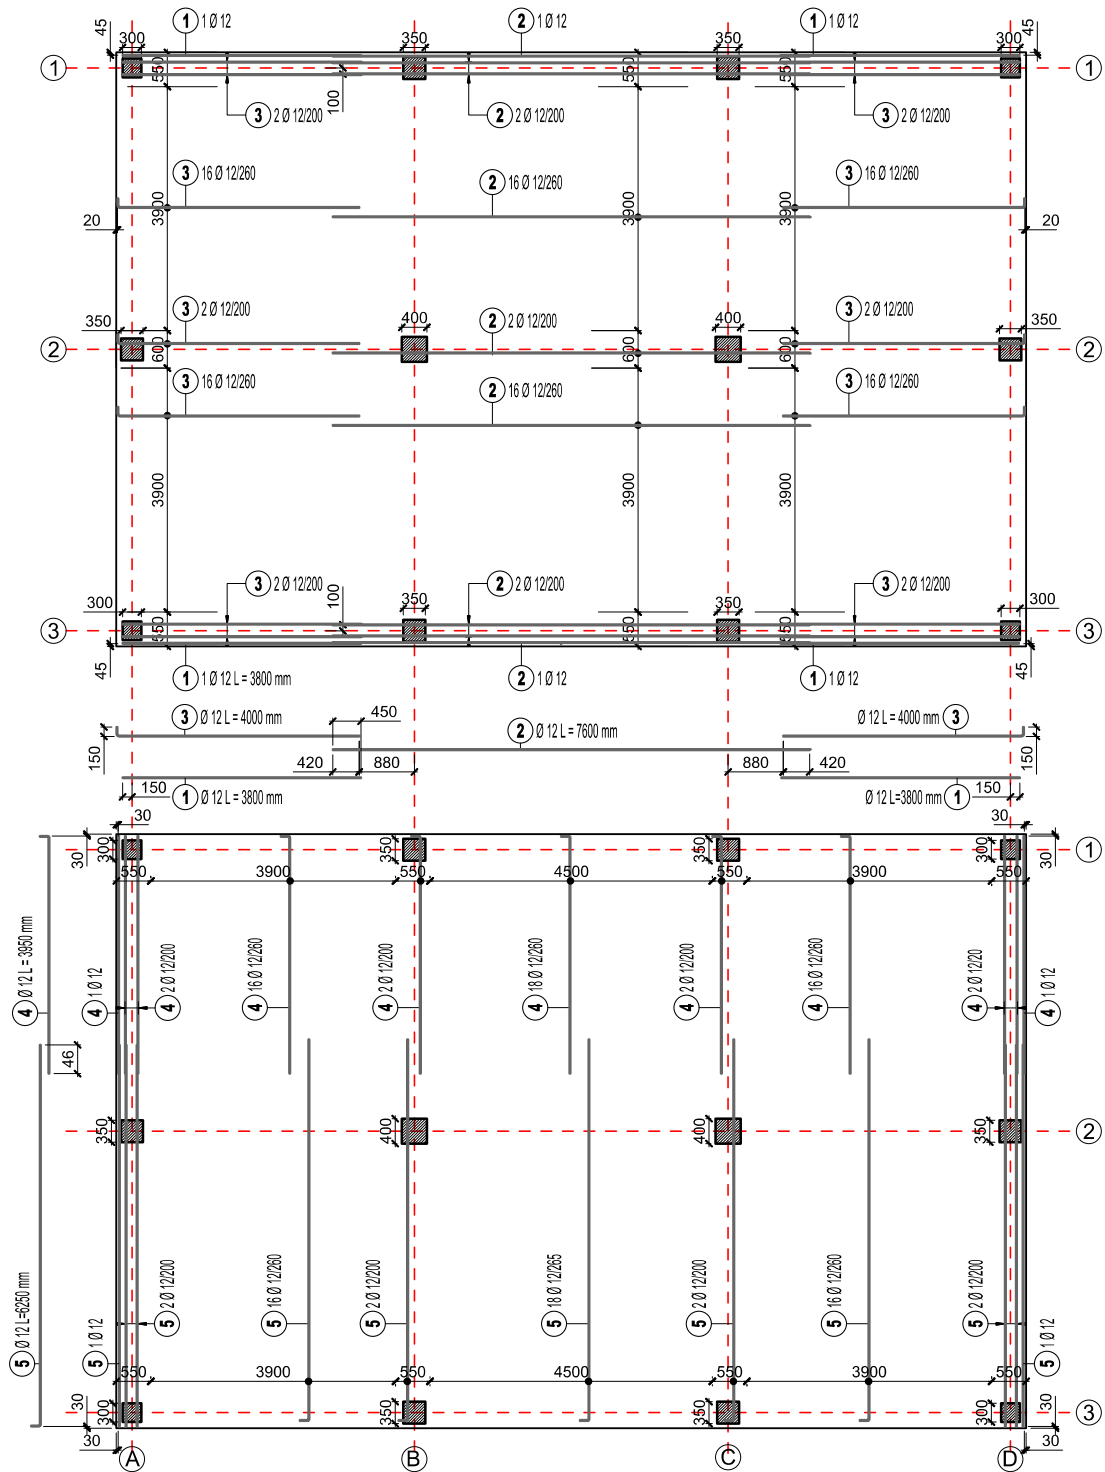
Bottom longitudinal reinforcement in the slab of the 1st and 2nd floor.
